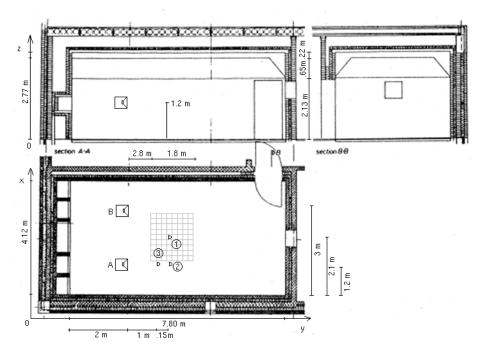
Listening test room, dimensions shape and measurement set up, adapted from [14].
